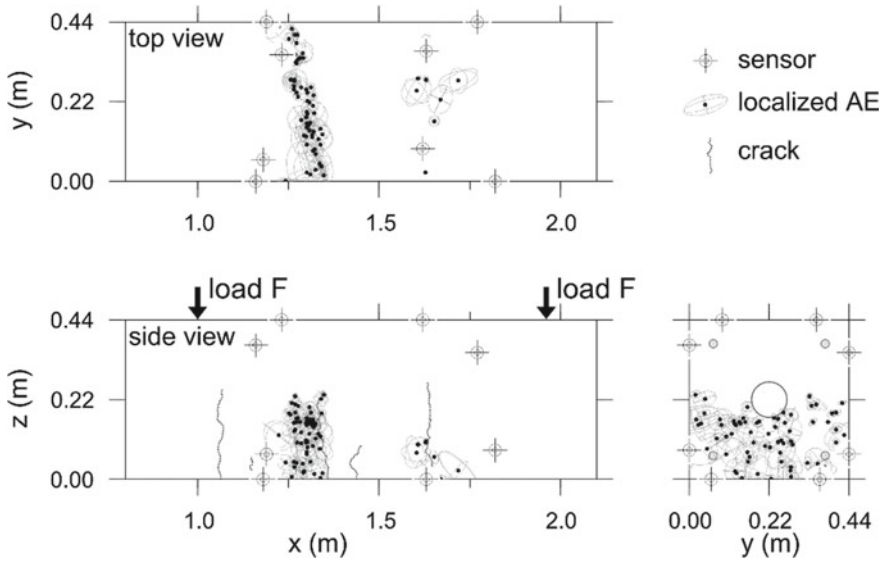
Localization results during crack growing. Top view (top), elevation view (bottom, with cracks seen from the front side), and cross section (bottom right) of the loaded part of the test beam
